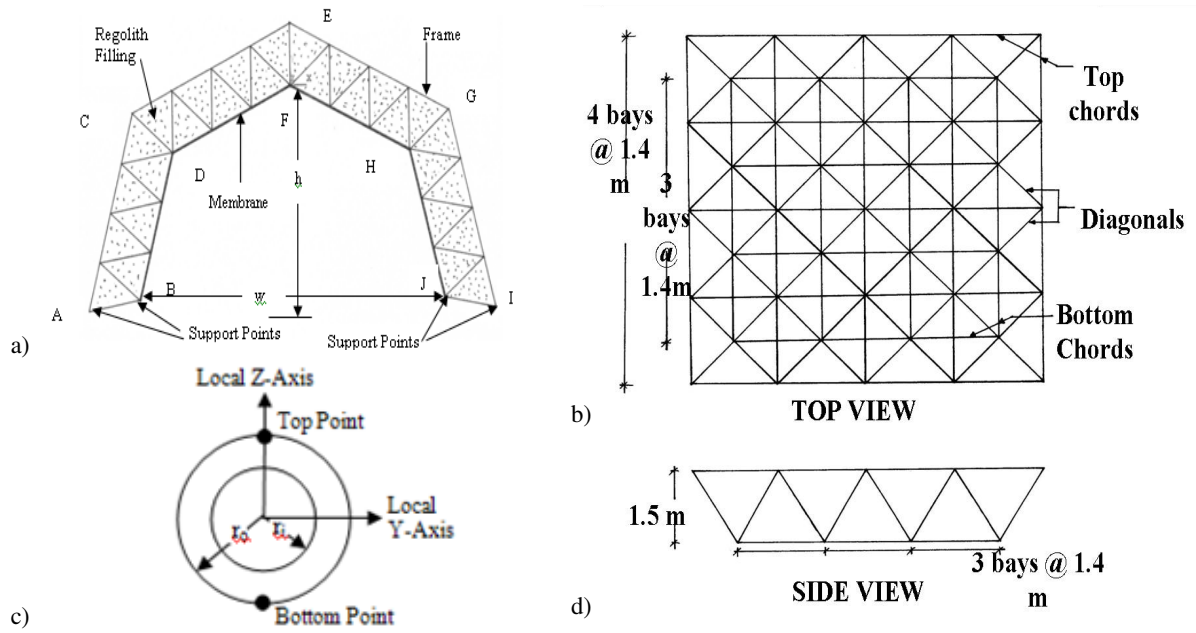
Proposed structure. a) Front view; b) Top view; c) Frame member cross-section with top and bottom of cross section marked; and d) Side view.
